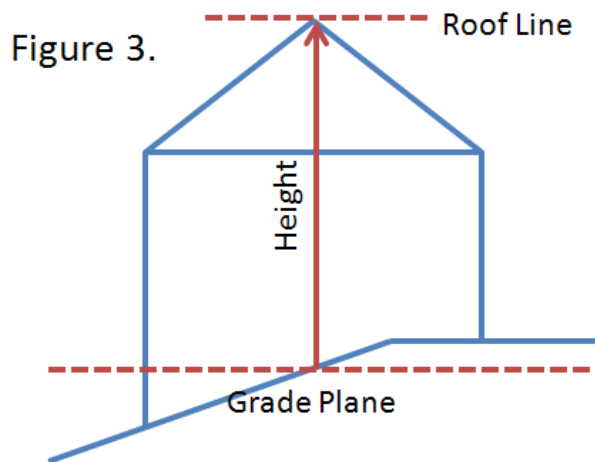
shows how height would be calculated under the proposed revision to the definition.
